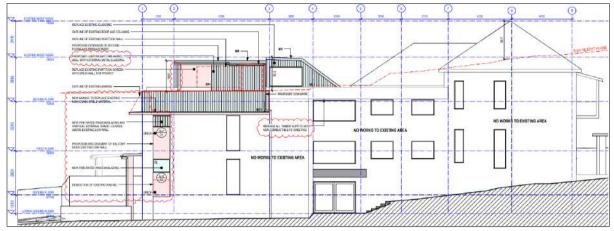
Extract of proposed Southern Elevation at area of proposed works
